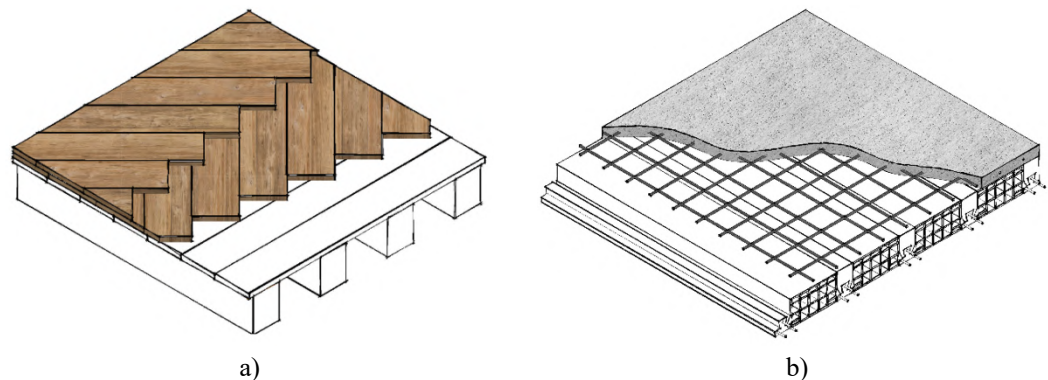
Reinforced timber floor with double planking crossed at +45° and -45° (a) and addition of composite slab in r.c. floors (b)
